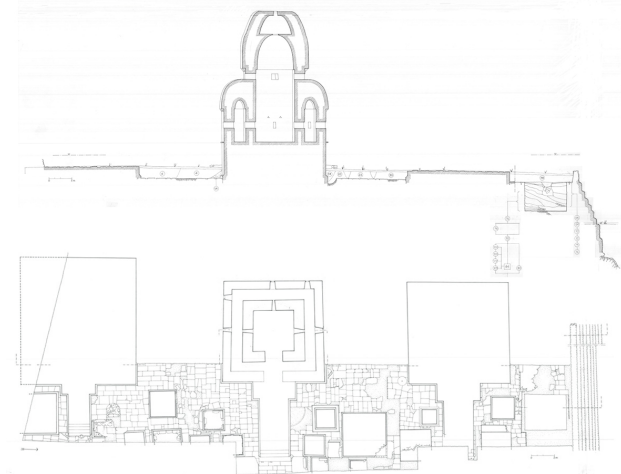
Gumbat: The archaeological area of GBK I. Cross-section and plan (after the end of the excavations; 2011).
